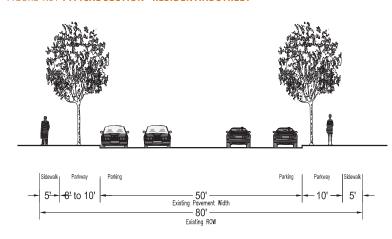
TYPICAL SECTION - 3RD STREET
